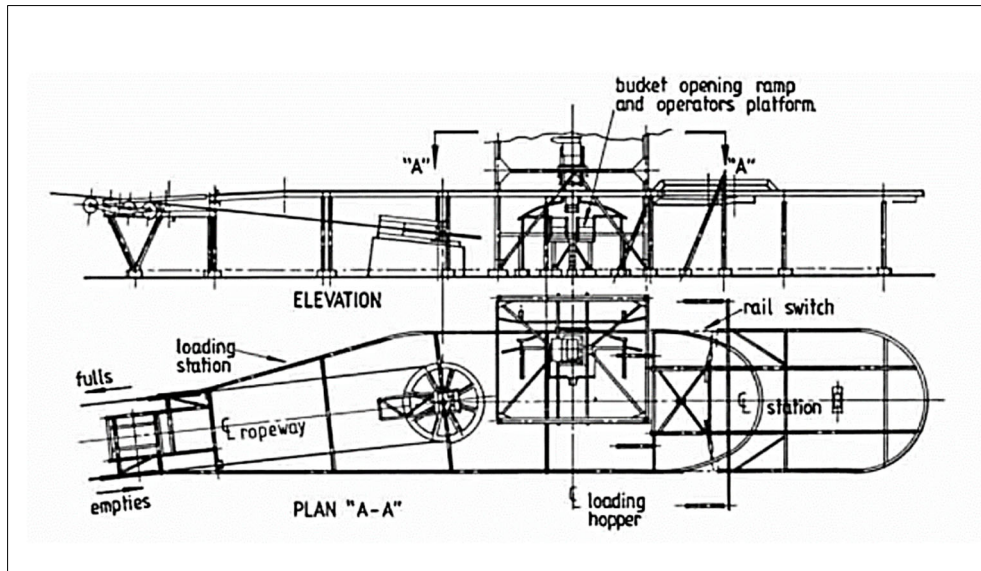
general arrangement of a loading station (Walker 1988, 419)
